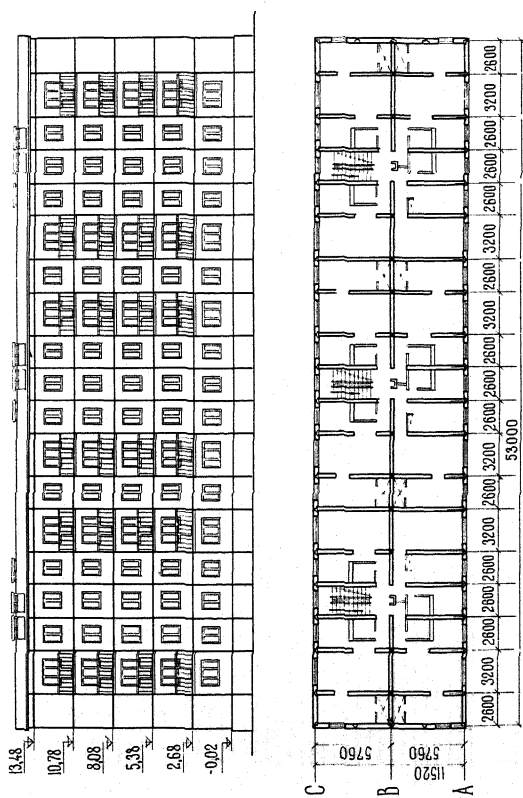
Façade and floor plan of the building made of reinforced concrete panels.
